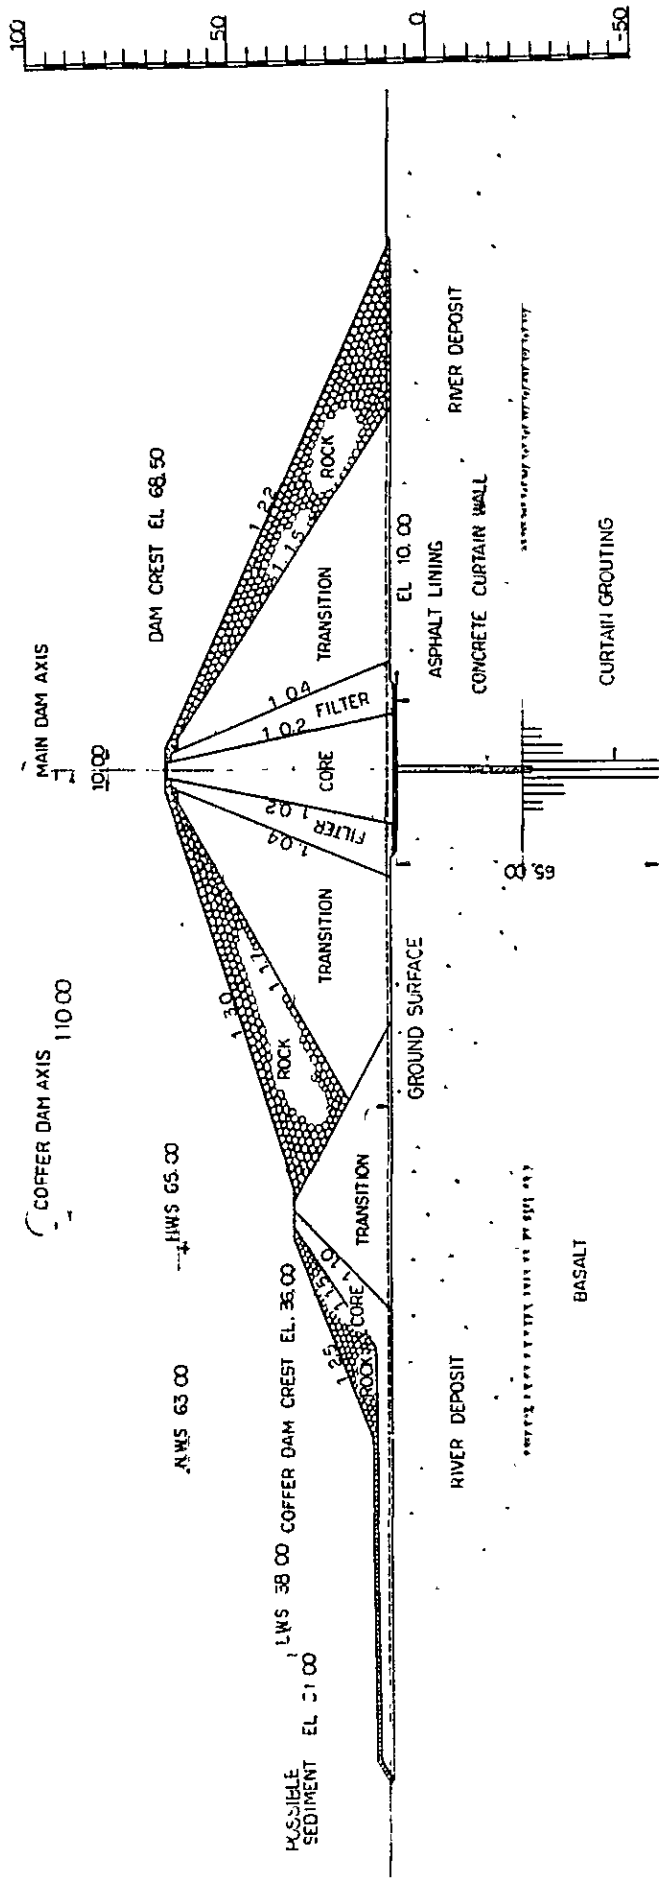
TYPICAL CROSS SECTION OF DAM (TYPE-B CONCRETE CURTAIN WALL)
